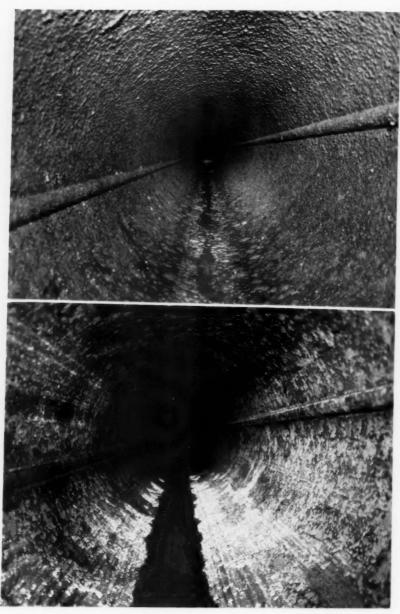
36-Inch Force Main; Above—Before Machine Cleaning: Below-After Machine Cleaning
